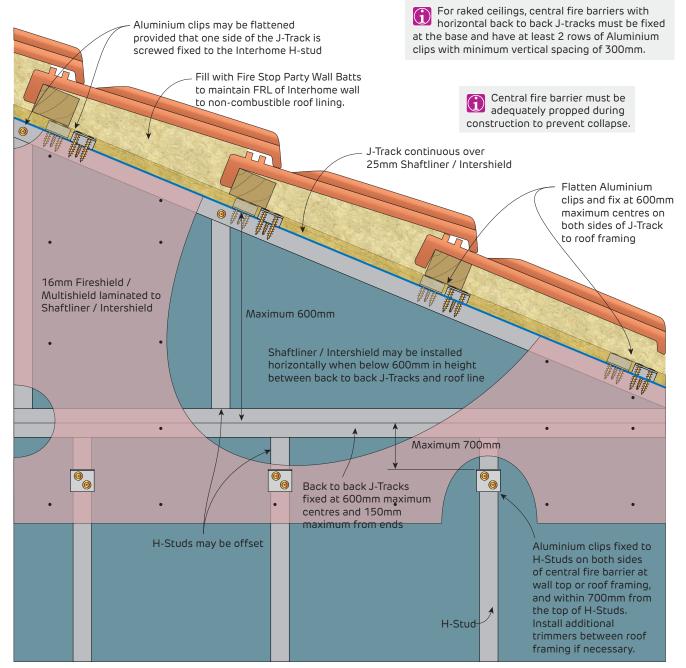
Interhome Wall to Roof Lining FRL 60/60/60 Section
